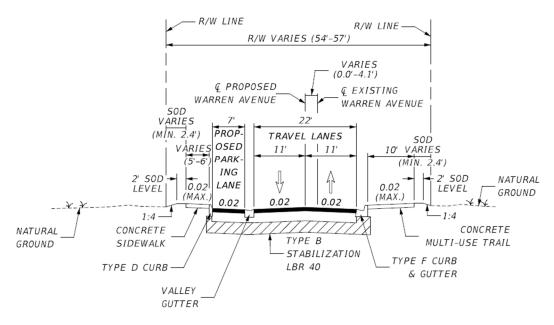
Alternative 1 Typical Section from 500 ft West of Lemon Lane to 320 ft East of Lemon Lane
